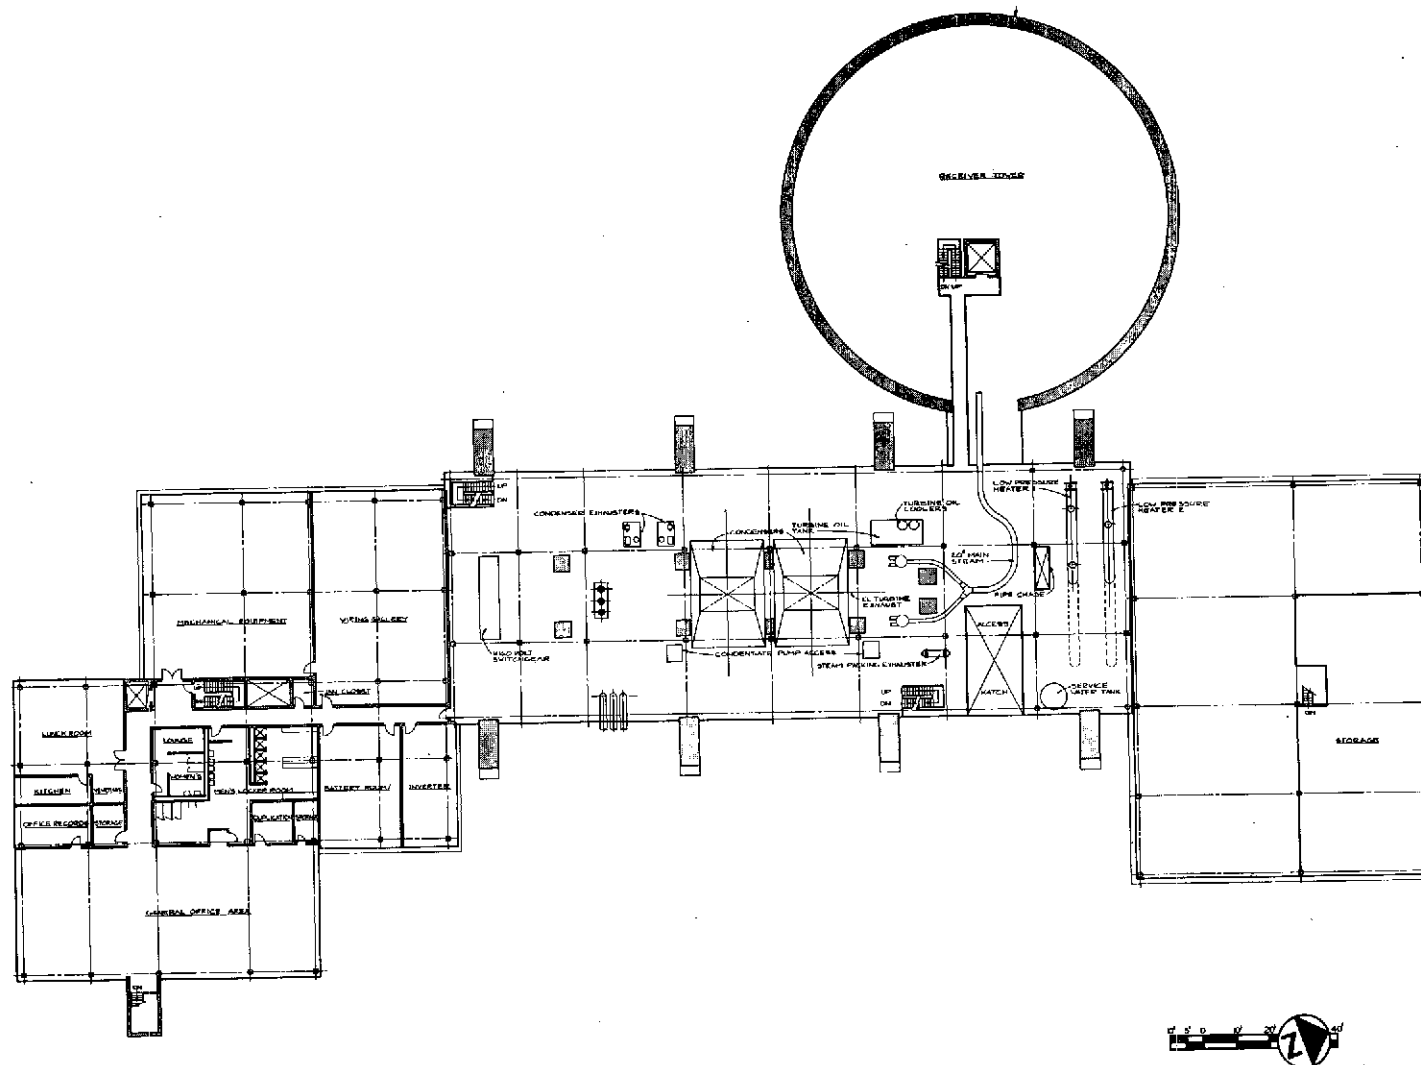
Mezzanine Floor Plan Reference Central Receiver Plant
